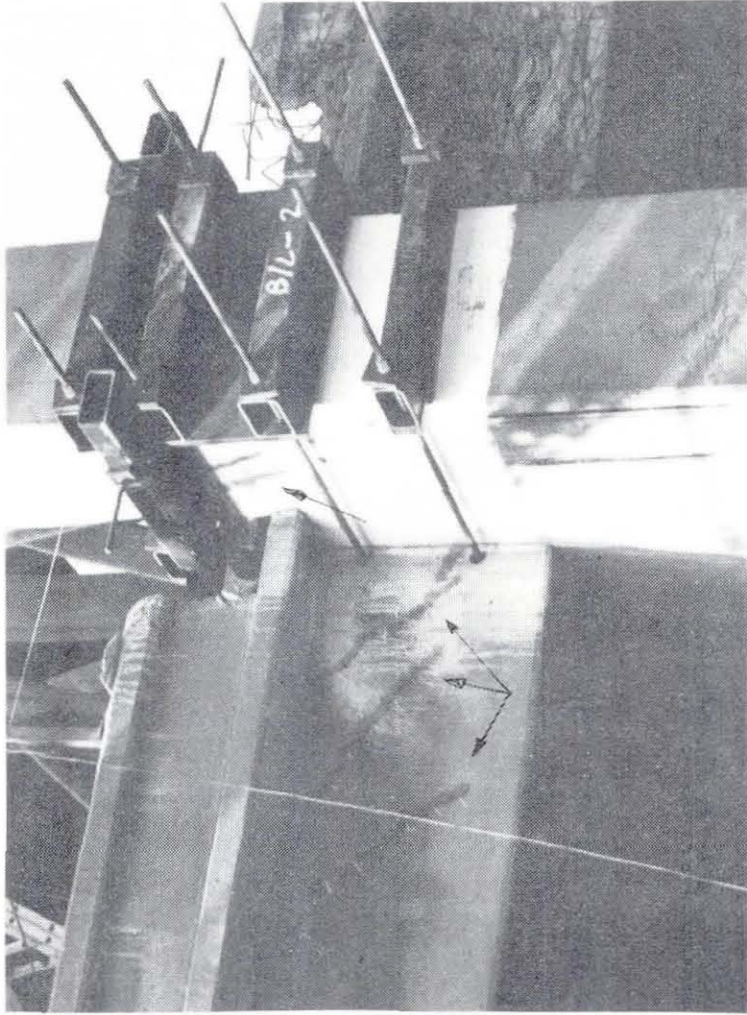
(a) Epoxied existing cracks on the east face of Bent 47.
